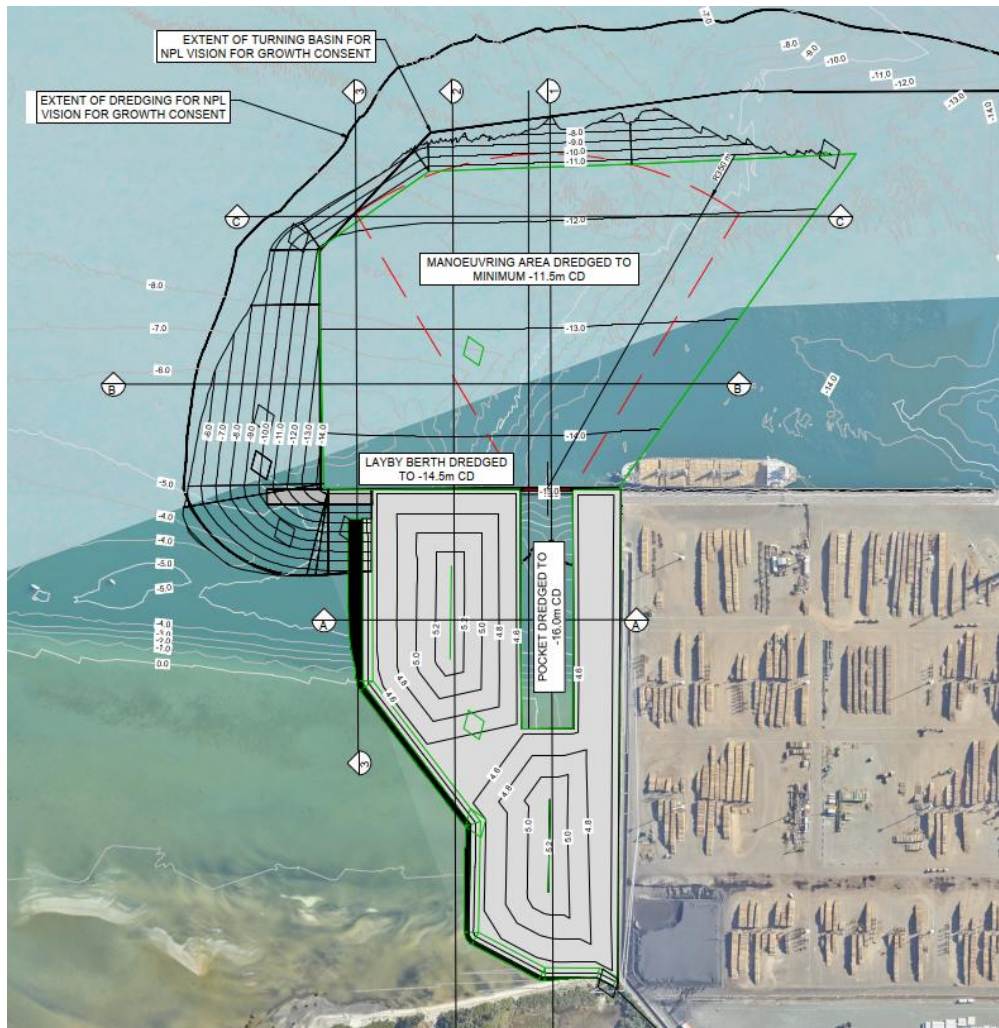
Spatial layout of the proposed facility with the stage 1 dredging footprint indicated by the green line
